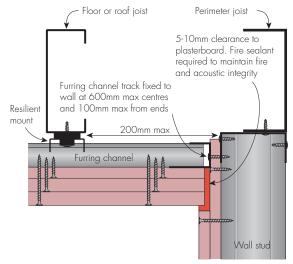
Fire Rated Ceiling to Wall -Alternate Detail
